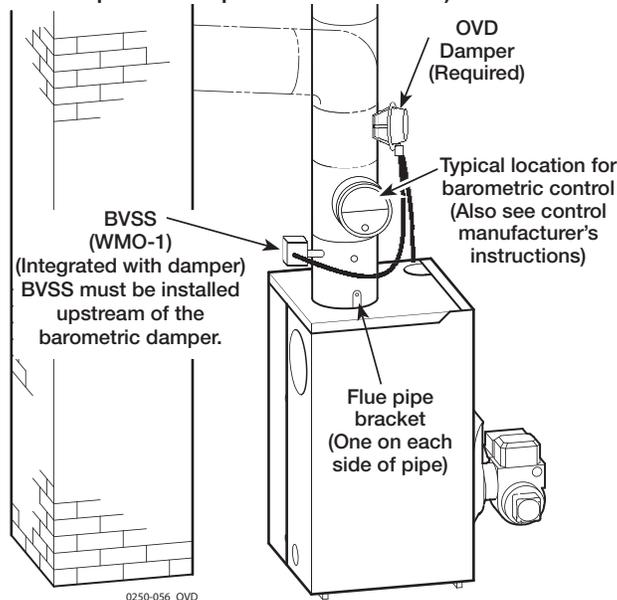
Standard back outlet chimney and breeching connections for models which require vent damper.
